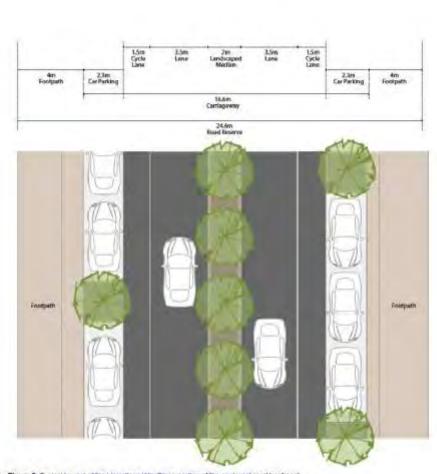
Typical Layout of the Hermitage Way Cross section of the east west road treatment
